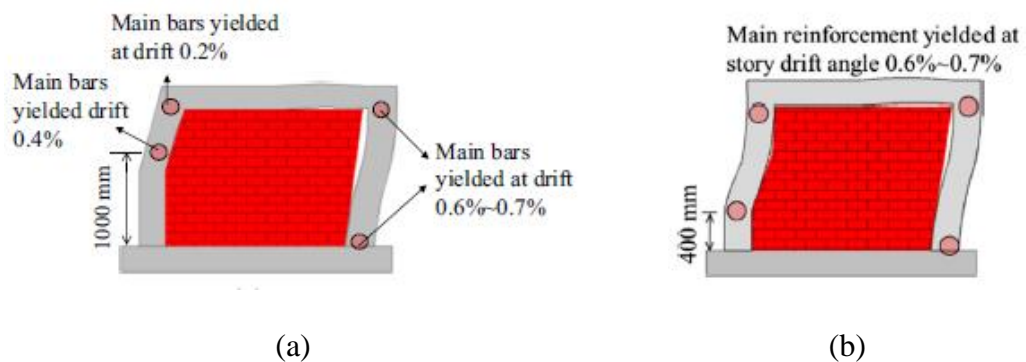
Hinge locations formed in RC frame Alwashali et al. (2017): (a) Specimen WF, (b) Specimen SF
